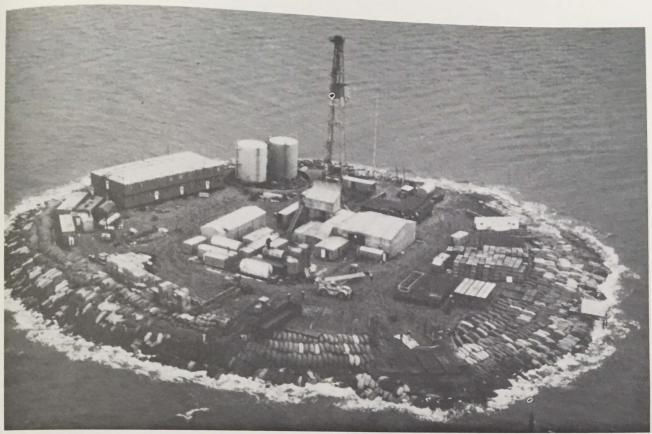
The Issungnak artificial island was completed in 1979 in 20 metres of water. Approximately 5 million cubic metres of granular material was required to complete the island, much of it dredged from the sea floor. Sand filled plastic bags placed on netting protect the beach from erosion.
